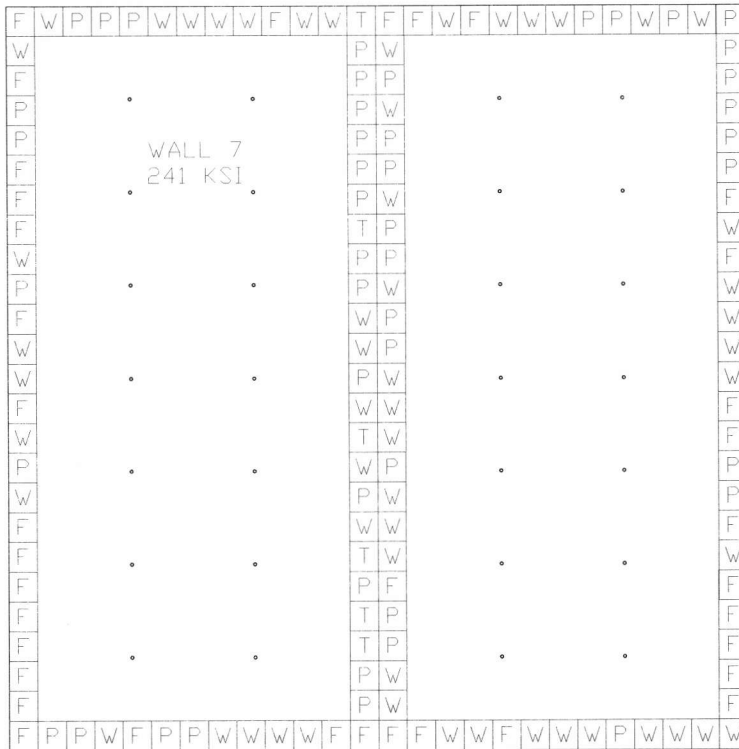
Sheathing nail failure modes for Wall 7, $f_{yb}=241$ ksi.
